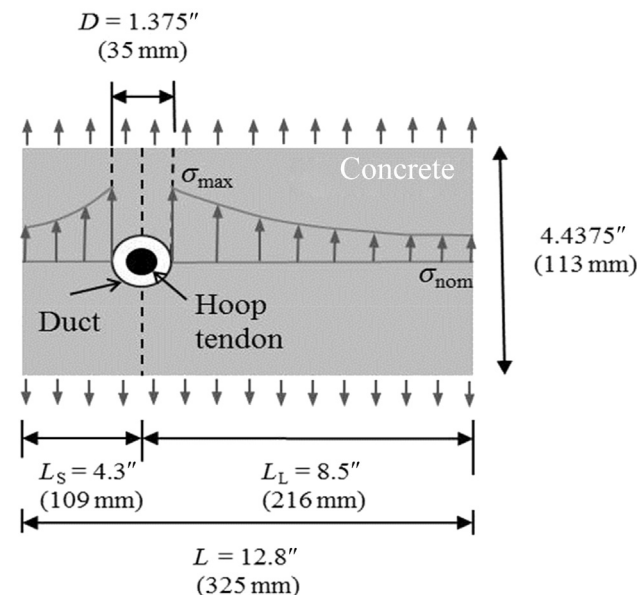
Wall section with hoop duct hole under vertical tension.
